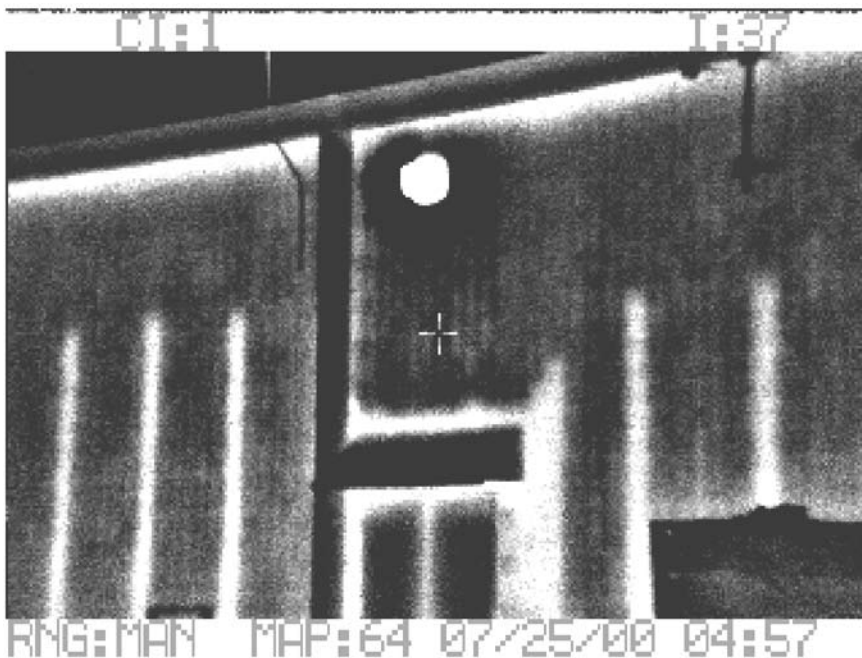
Infrared Picture of a CMU Wall with Discontinuities in the Grout
